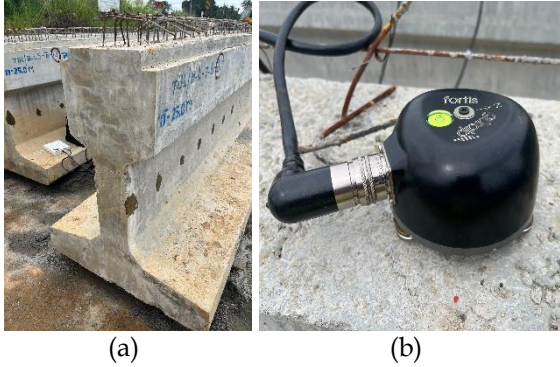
Experimental setup: (a) beam specimen, and (b) beam instrumented with accelerometers.
